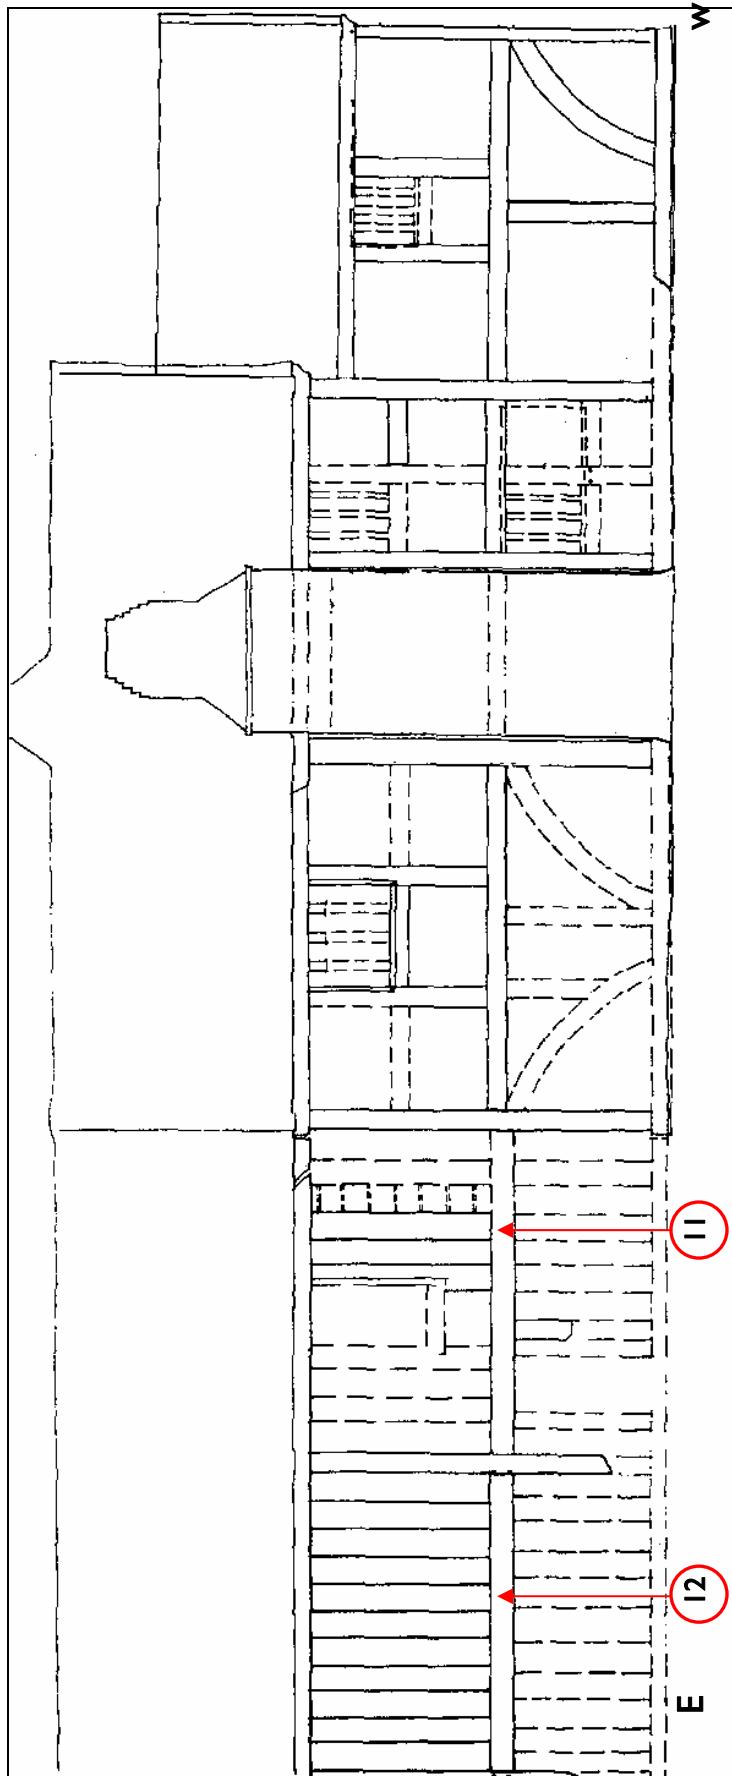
North elevation of the north cross-wing to show timbers sampled (after Jones 1975-76)
